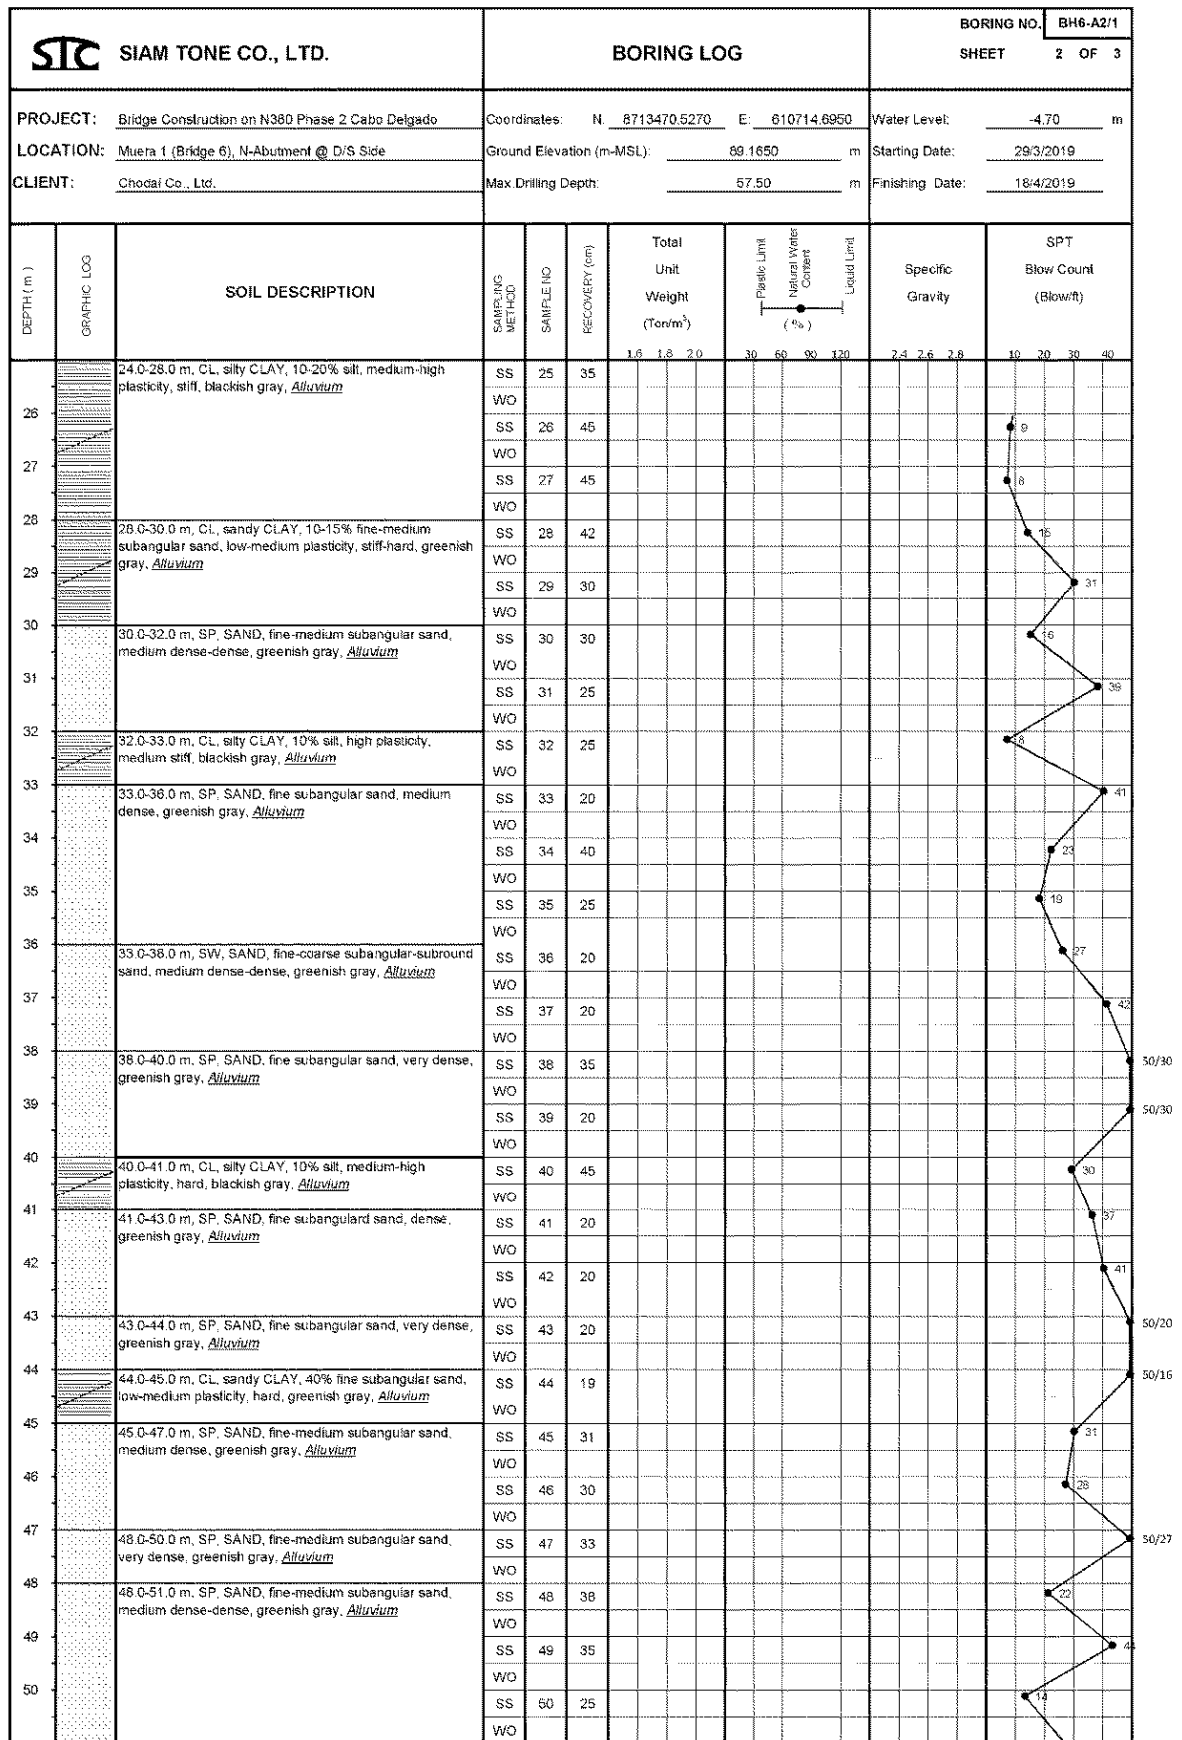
BH6-A2/1 at N-Abutment D/S Side of Muera I Bridge (B6)
